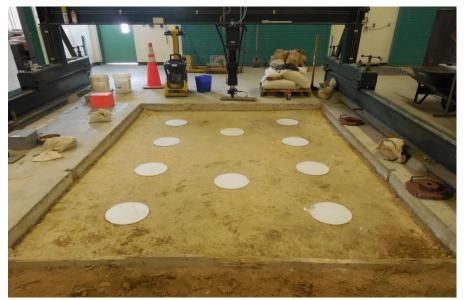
Photograph of east test pit limerock base ten PLT locations per half pit
